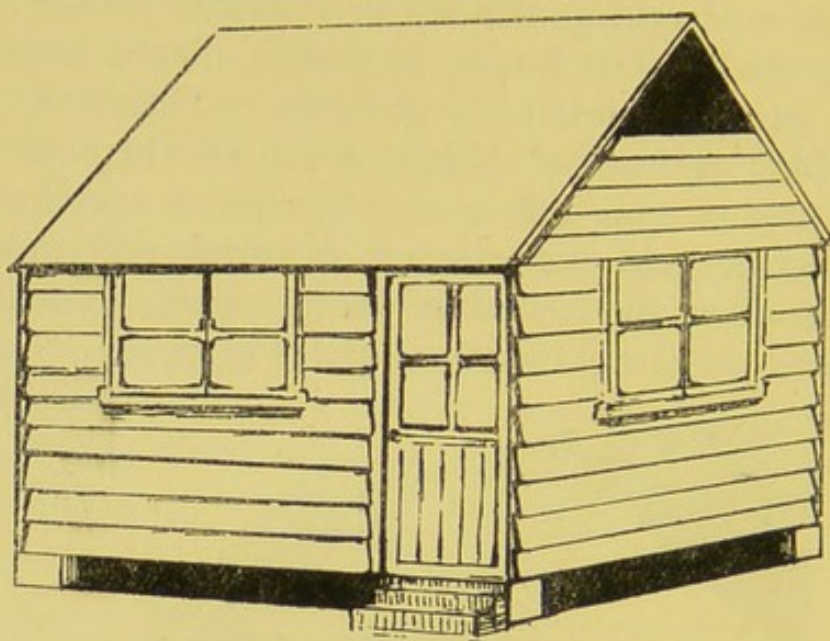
SHELTER WITH STEEP-PITCHED ROOF—FRONT VIEW.
